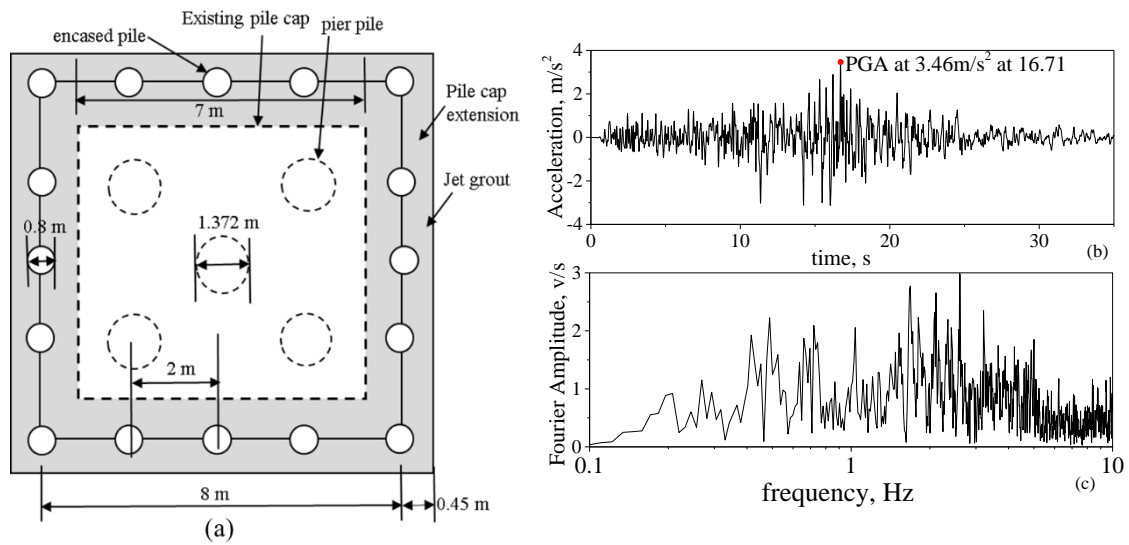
(a). Plan view of pier pile foundation with encased piles in jet grout, (b) Chosen GM#1 for dynamic analysis and (c) Fourier amplitude of GM.
